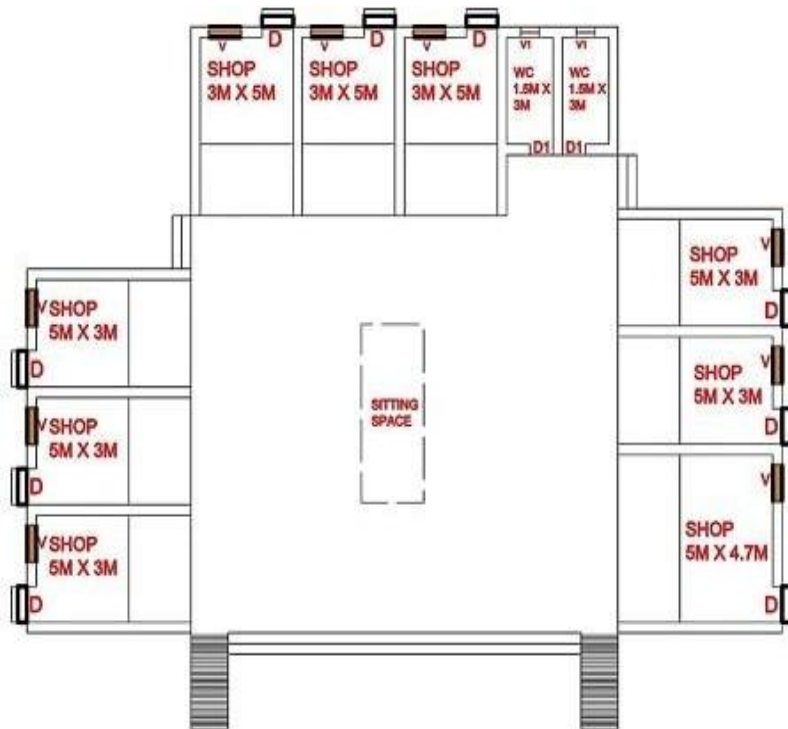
AGRICULTURE MARKET BUILDING PLAN
